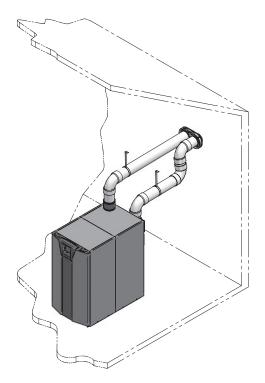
Two-Pipe Sidewall Termination - See page 23 for more details
